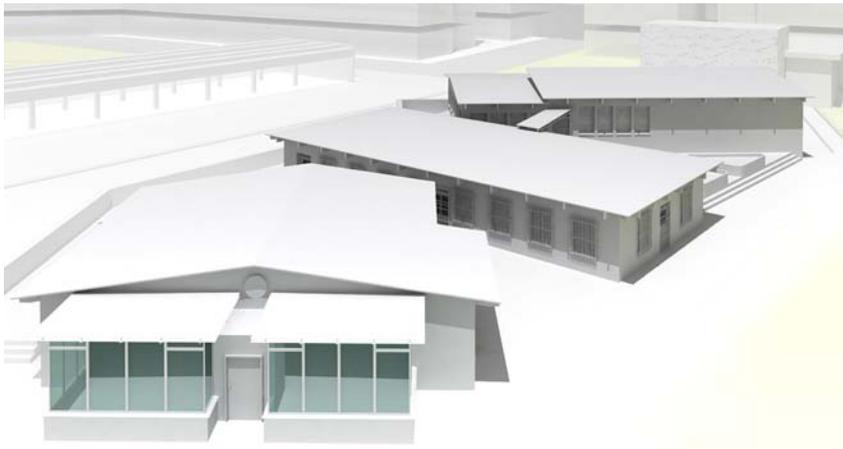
View of Bateman, Vetman and Stoneman buildings from the Northeast
